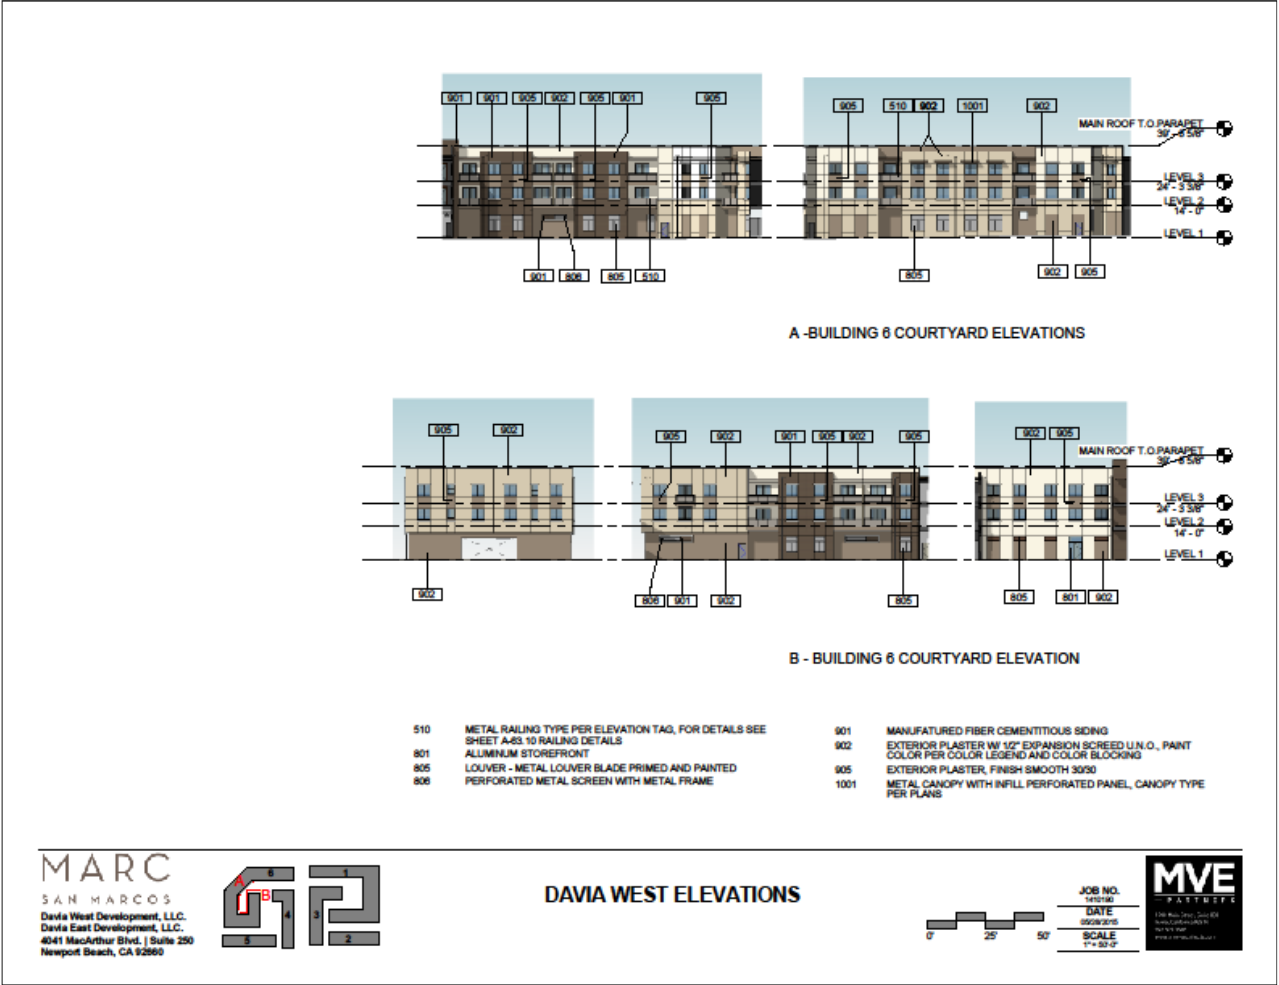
Davia West – Building 6 Courtyard Elevations
